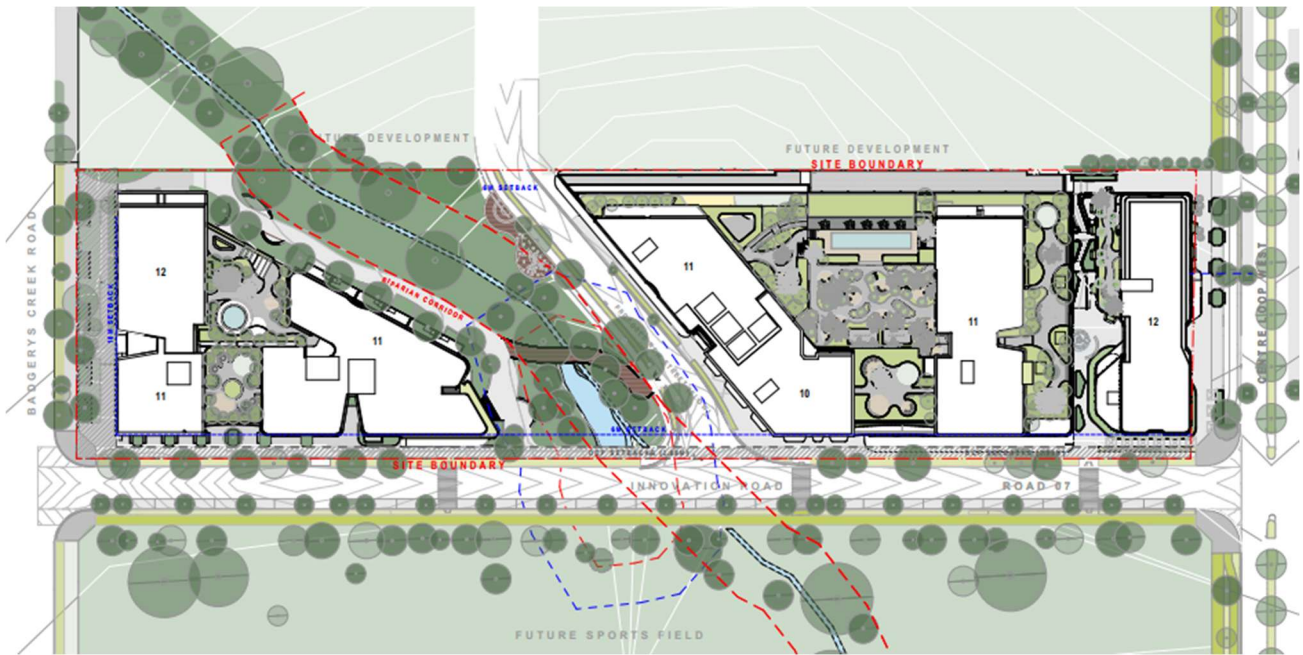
Proposed Site Plan extract showing the layout of the development
